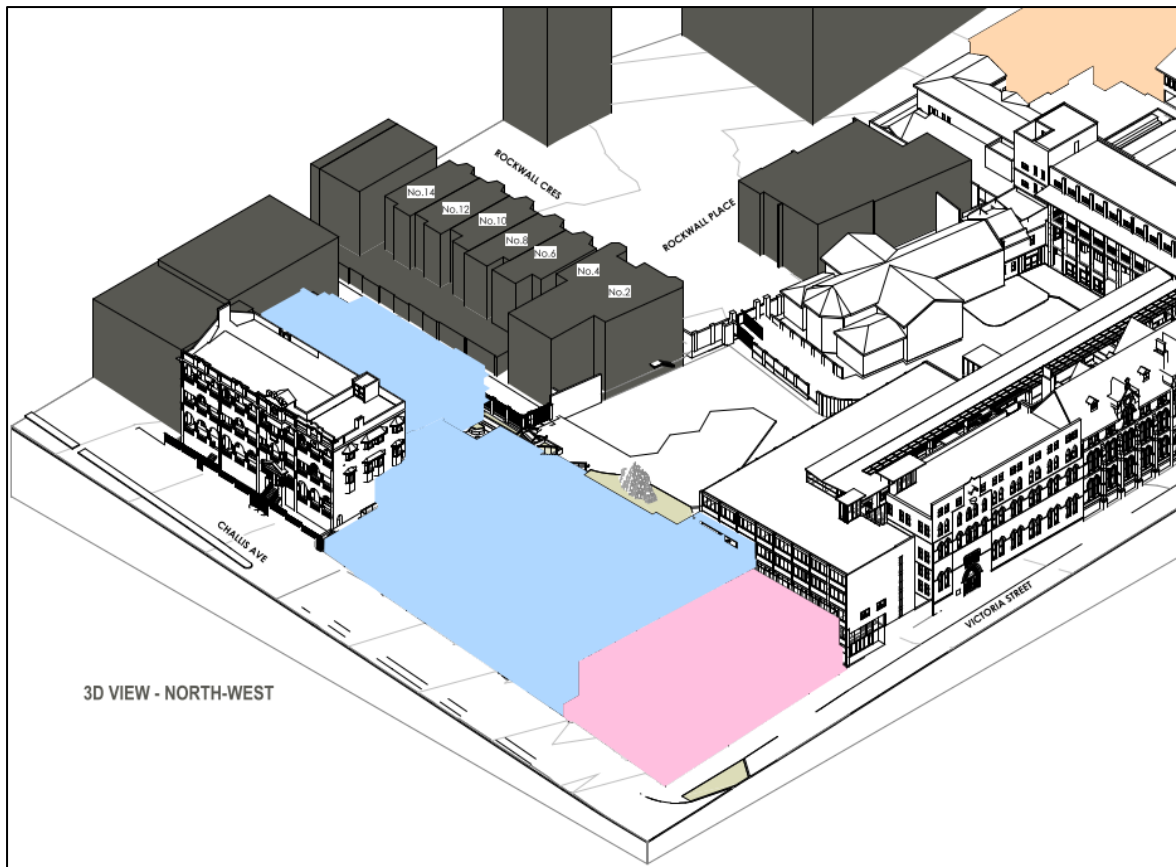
Proposed new built form located on the corner of Challis and Victoria Street
